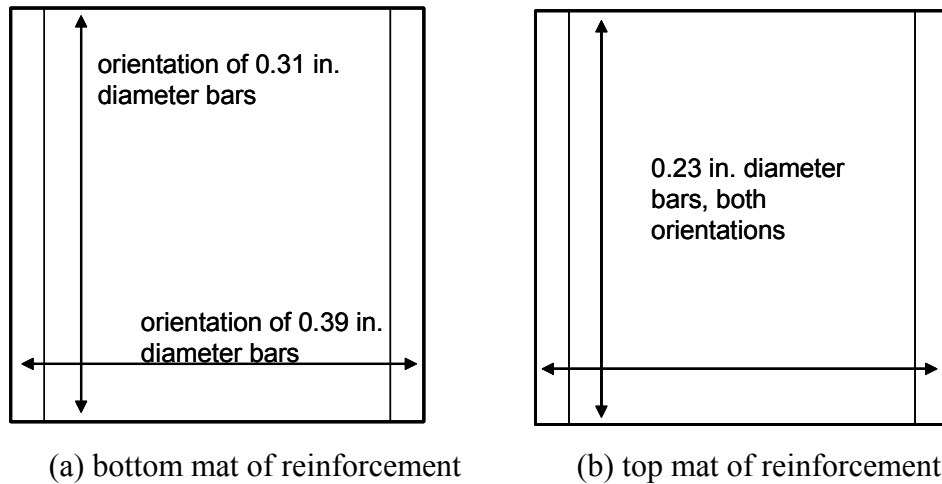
Orientation of test specimen reinforcement (Azad et al. 1993)
